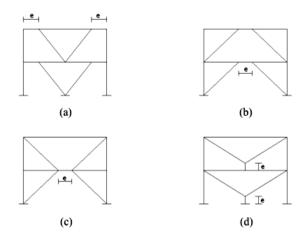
Different types of eccentric steel bracing systems (a) V-bracing, (b) K-bracing, (c) X-bracing, and (d) Y-bracing (Ozel 2010)
